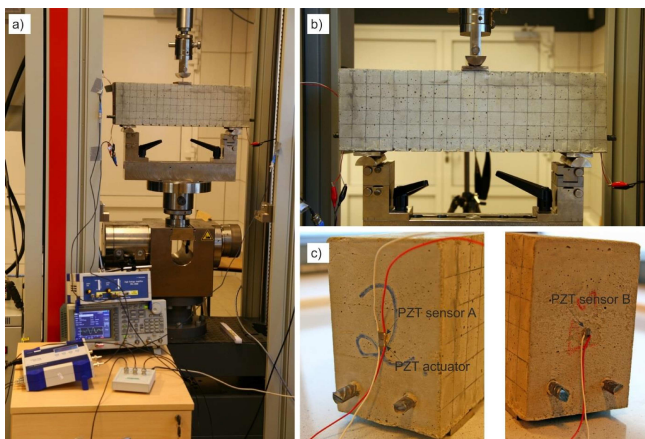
Experimental set-up for combined bending and ultrasonic tests in the concrete specimen: a) photograph of instrumentation; b) the specimen under three-point bending; c) details showing location of the PZT actuator and the PZT sensors on the specimen
